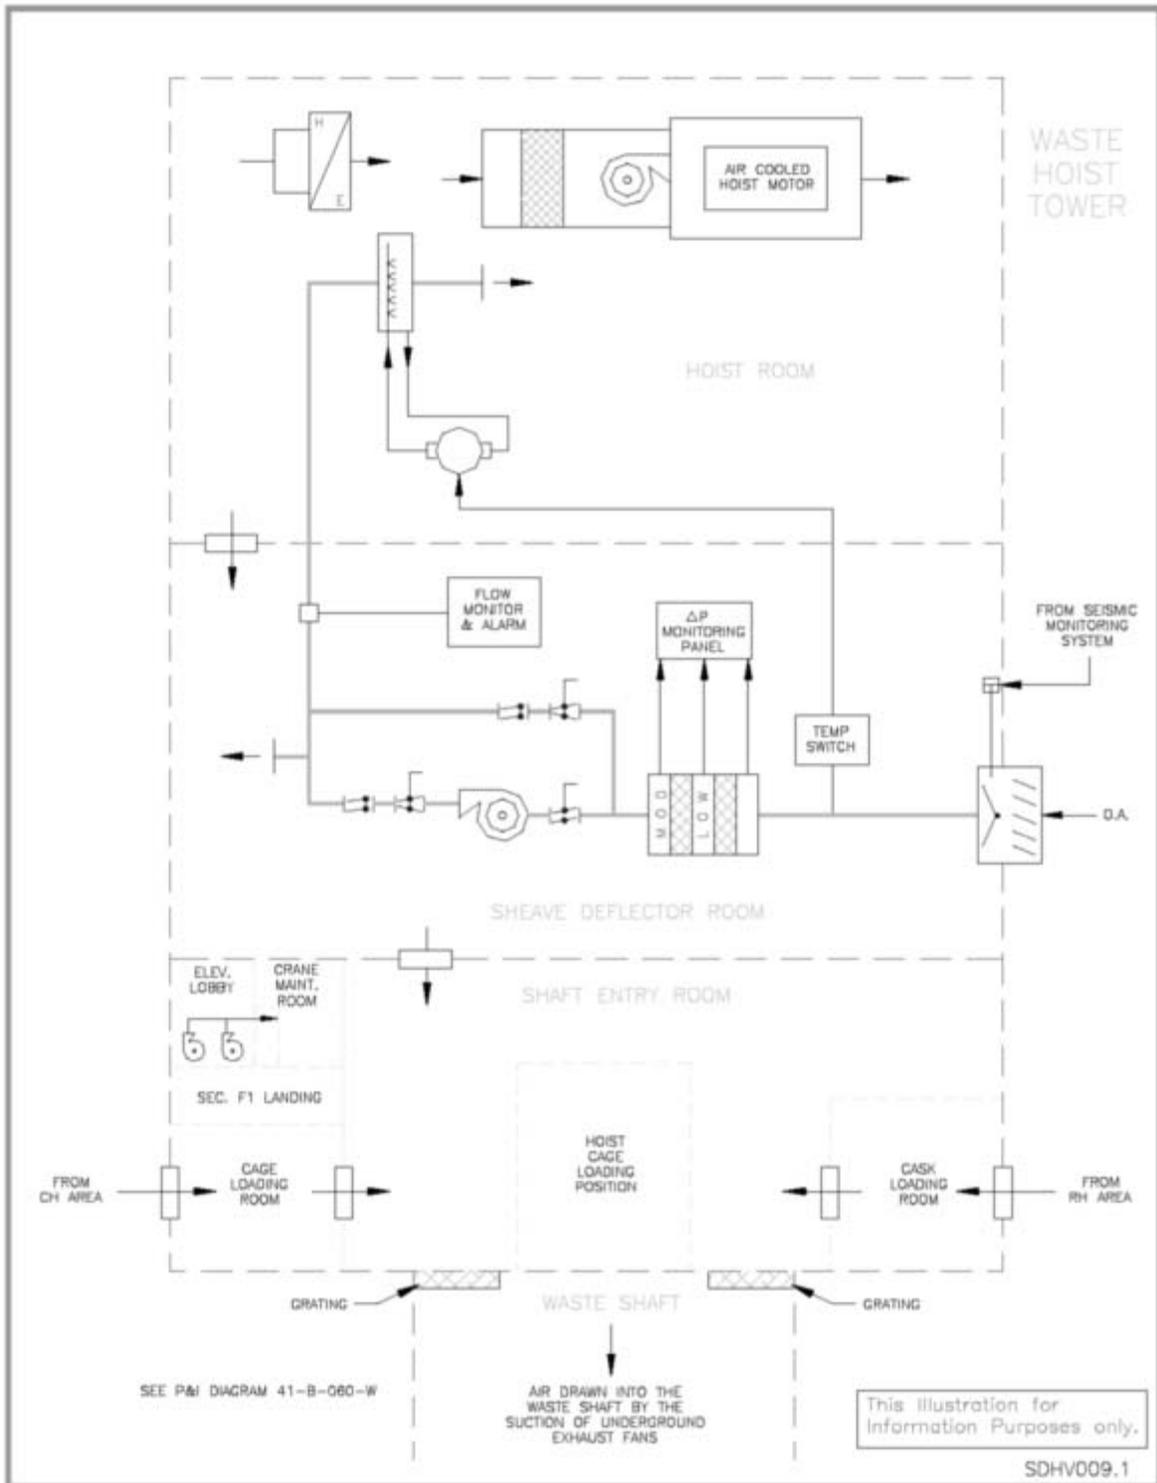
Subsystem HV01 Waste Hoist Tower HVAC Block Diagram
